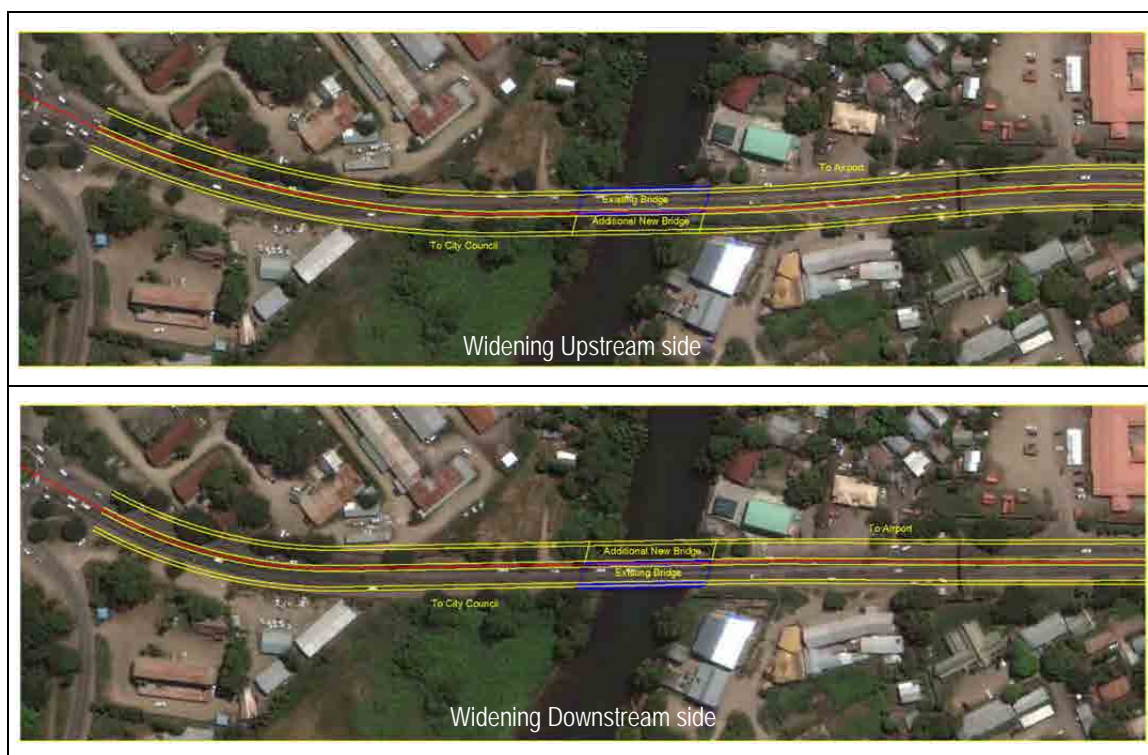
Comparison of Road Alignments of Alternative Additional Bridge Locations
